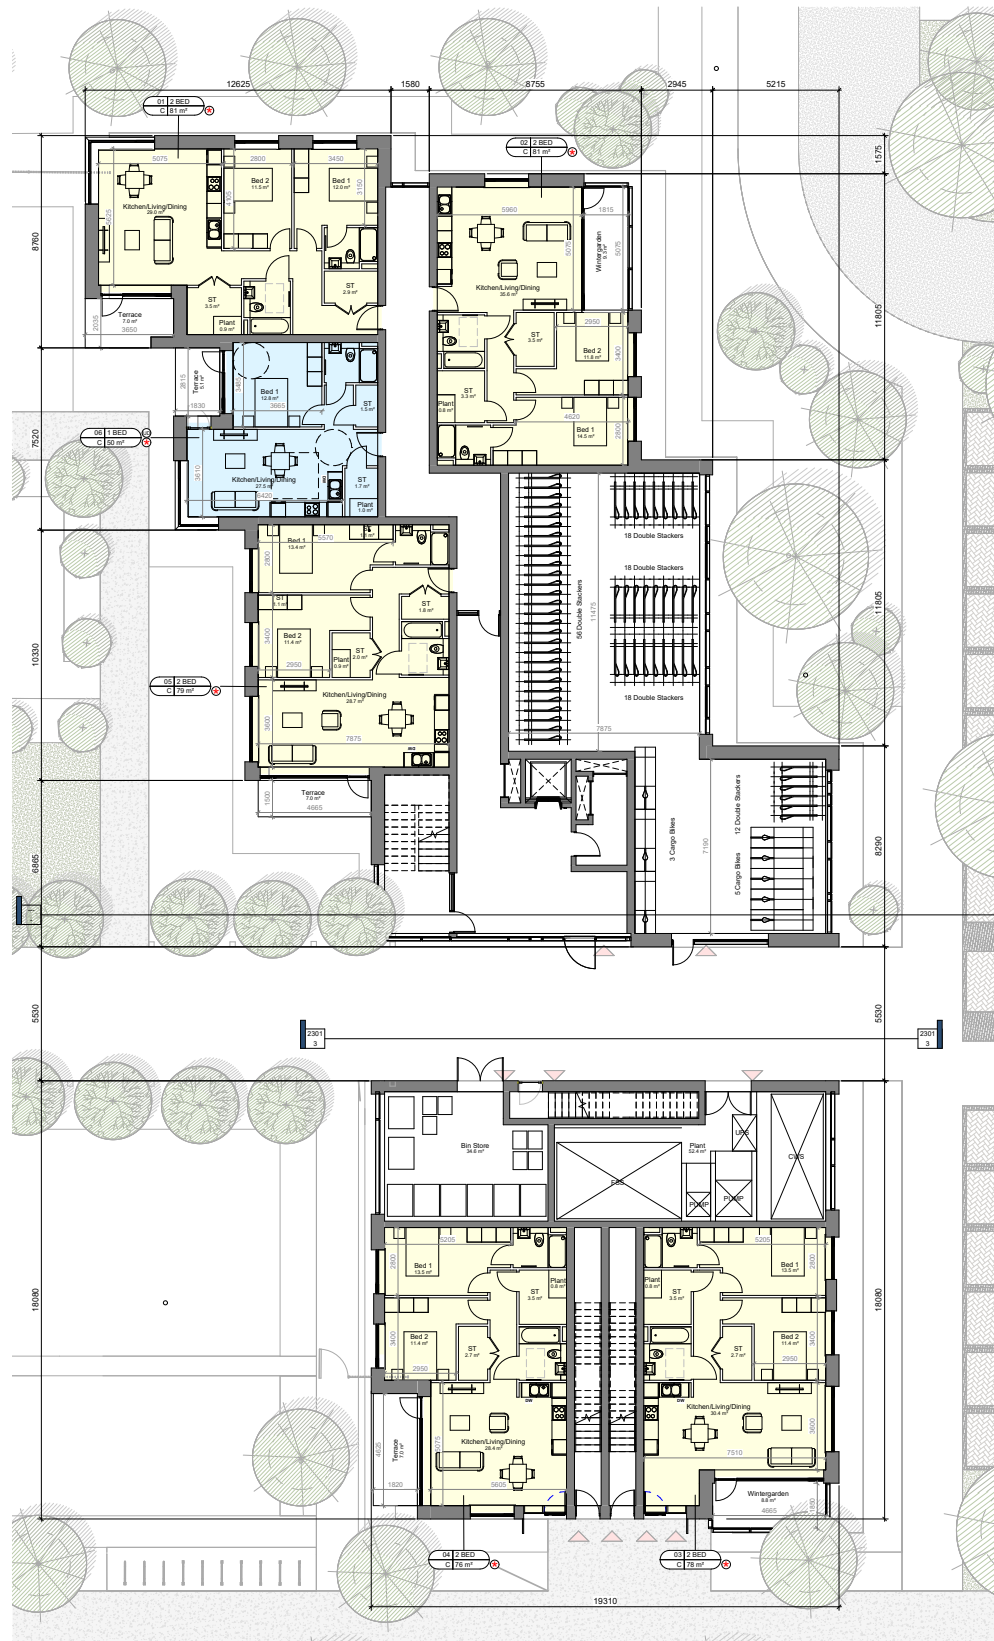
Block C – Ground Floor Plan Source: MCORM, 2026.
